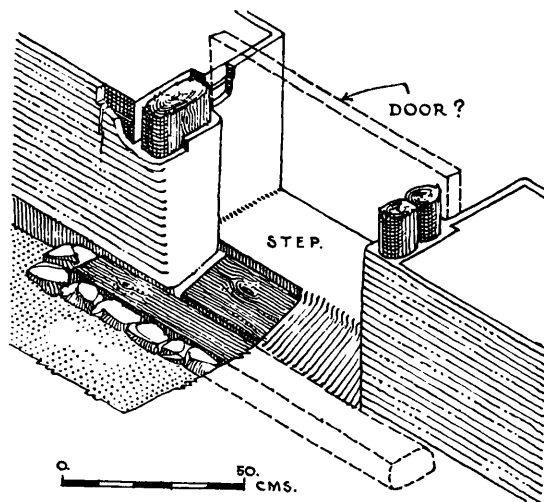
Detail of doorway to priest's room behind Shrine XIV "B"
